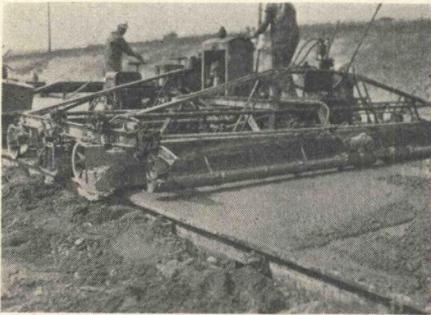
The vibrator in the raised position, showing the tube with vibrating motor mounted near the middle, and the mounting of the vibrating assembly ahead of the finishing machine screed. (The metal strips appearing as light-colored "posts" on the tube carry the needles used in making smoked-glass tracings of the movement of the vibrator.)
